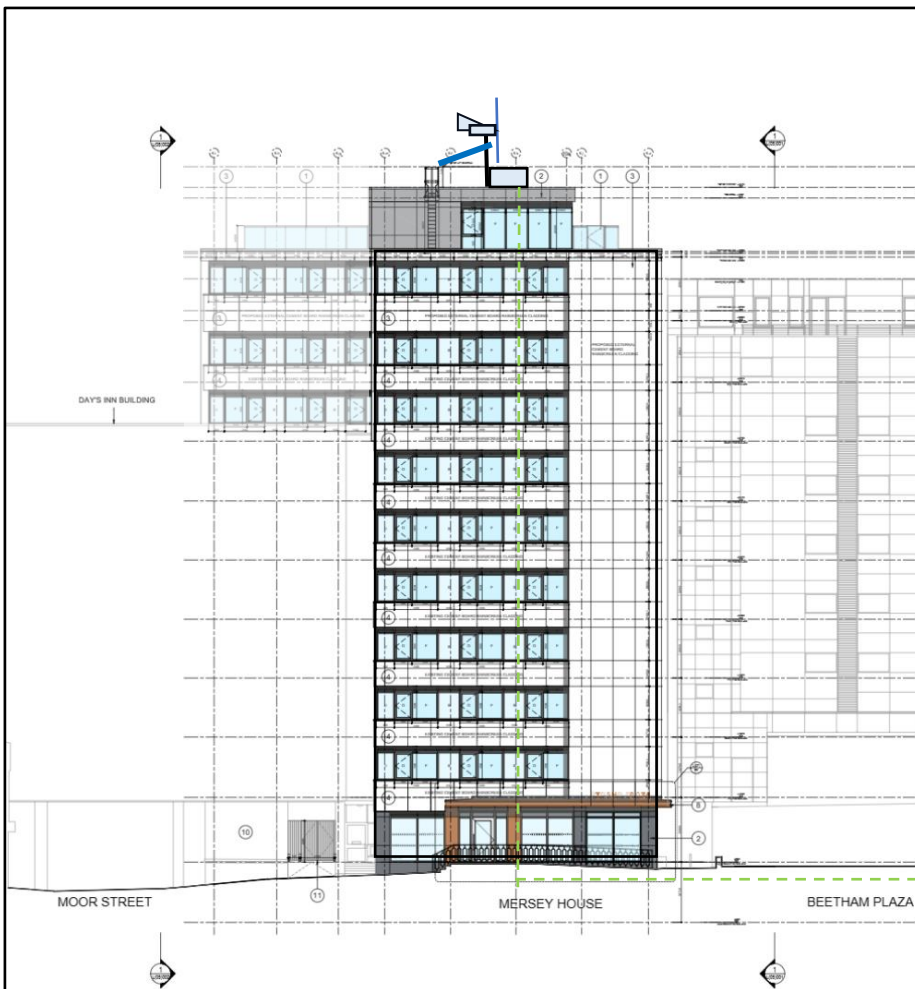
NE Elevation of Strand Plaza, showing possible position of installation & wiring runs
